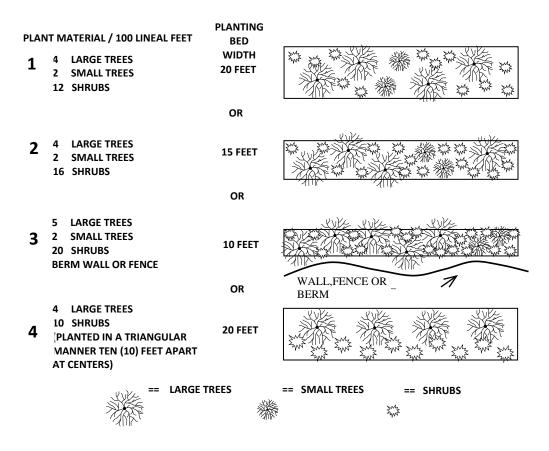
Site Perimeter Landscaping Requirement Options Illustrated.
